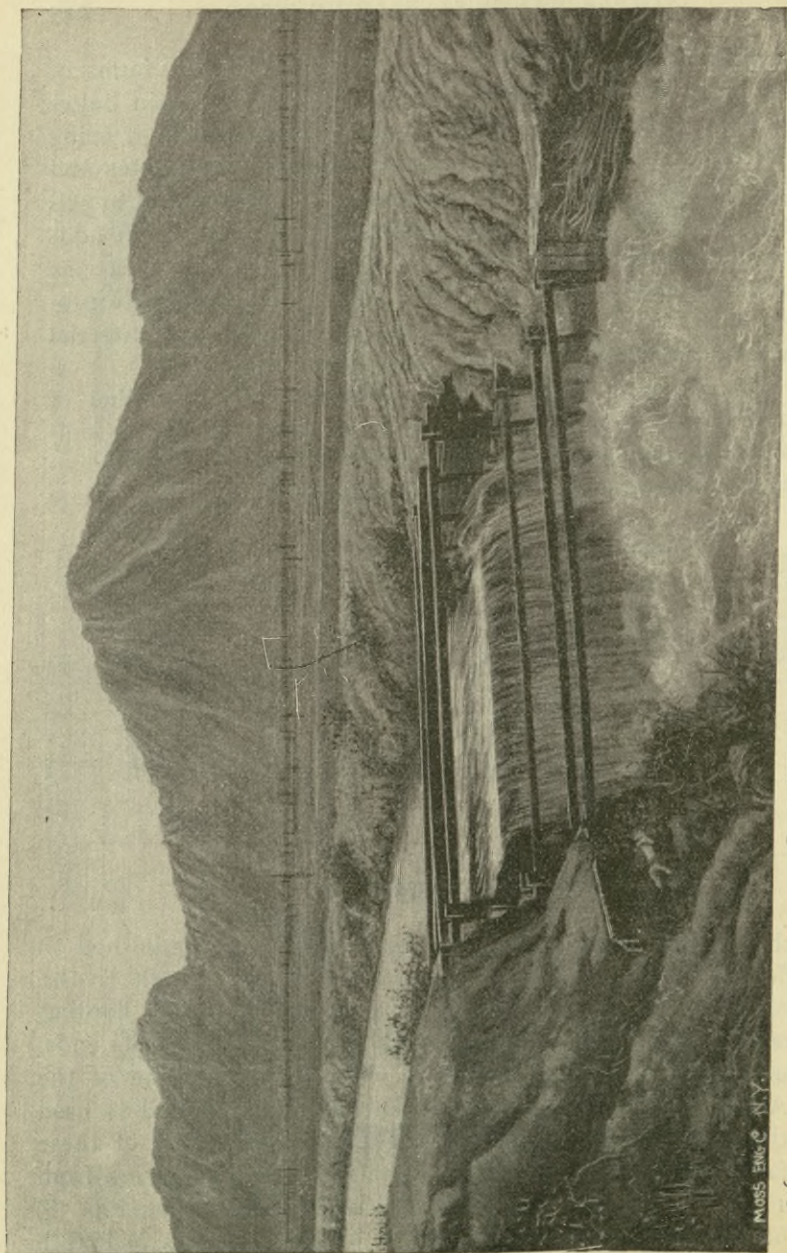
PLATE XVI.—VIEW OF FALL ON ARIZONA CANAL.
